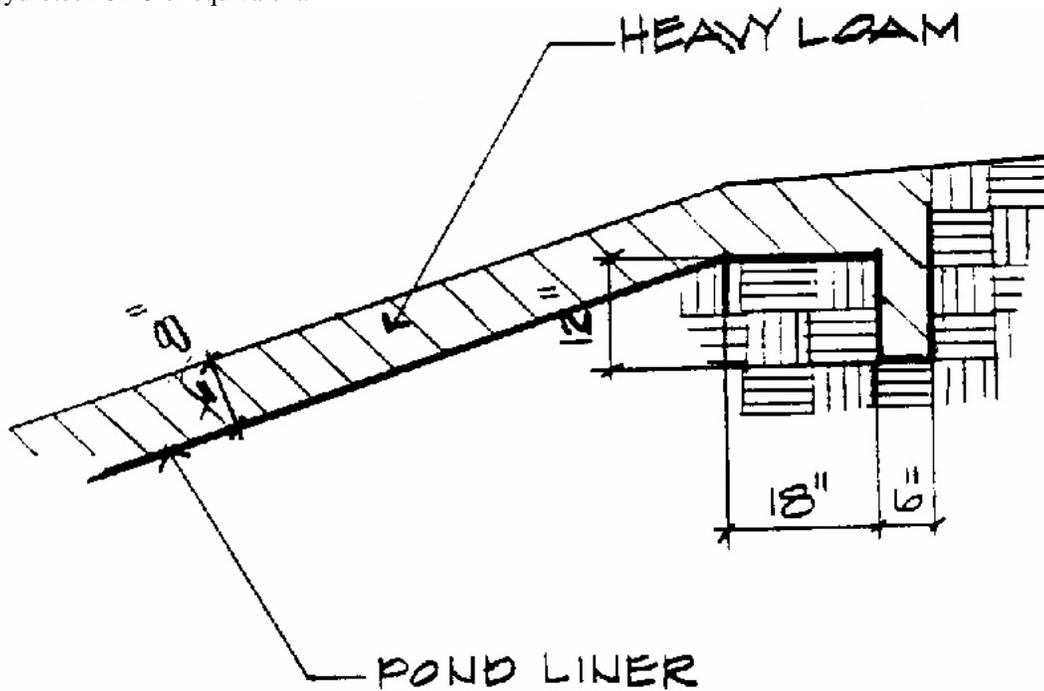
Example of Liner Installation on Earthen Slope (Courtesy COA)
